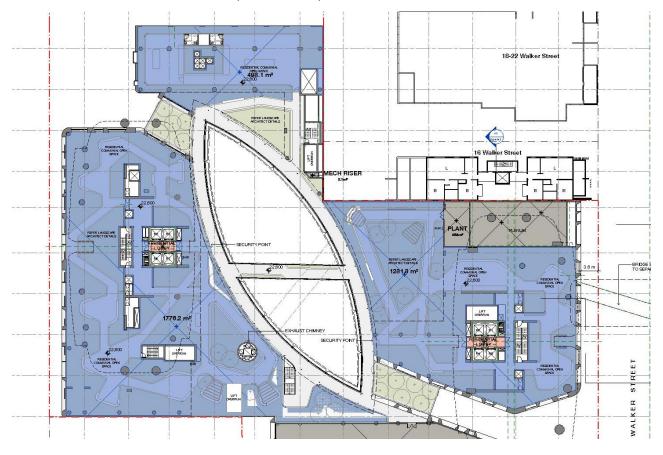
PROPOSED COMMON OPEN SPACE (SJB ARCHITECTS)
